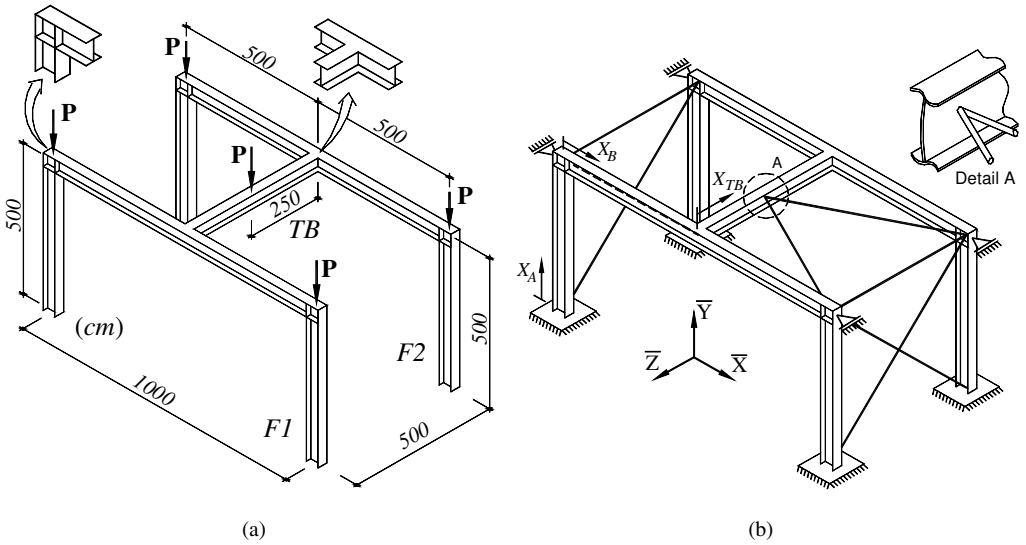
Space frame (a) geometry and loading, and (b) support conditions and transverse beam bracing detail.
